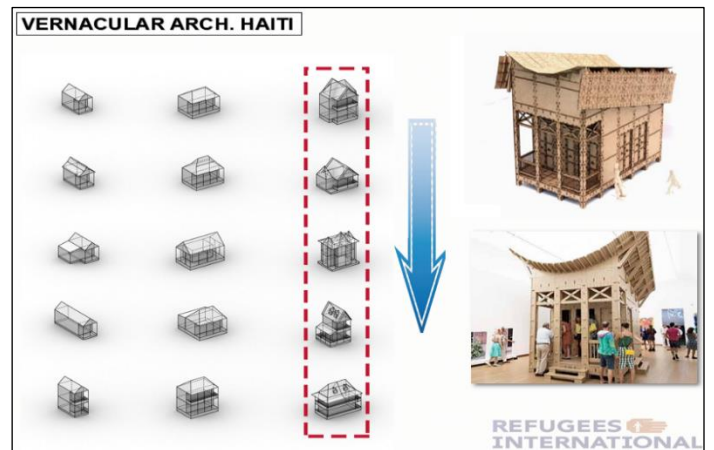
GINGER-BREAD HOUSE, Housing type was introduced in the post-colonial period, Therefore acts as a vital symbol for rebuilding Haiti, Characteristic is its intricate ornament and steeply pitched roofs, The construction of wooden sheets and beams has proved to be seismically resistant's. Source: [25].
